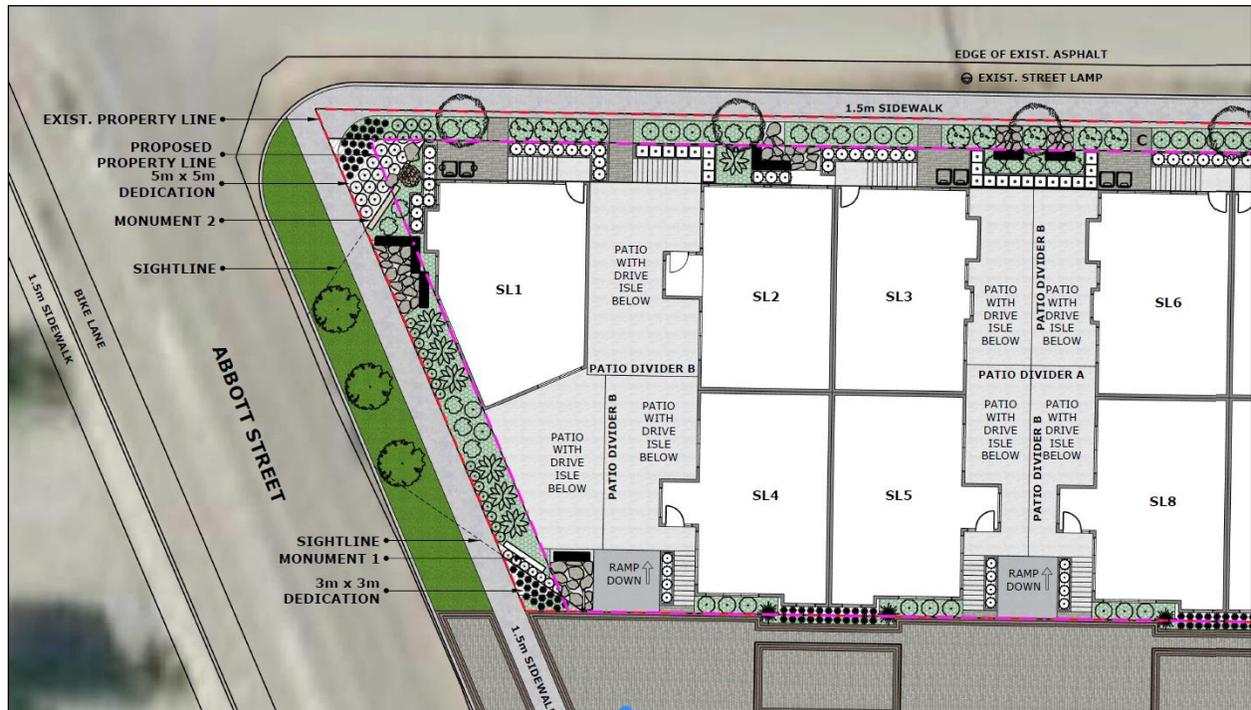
Landscaping at the corner of Abbott Street and Groves Avenue.
